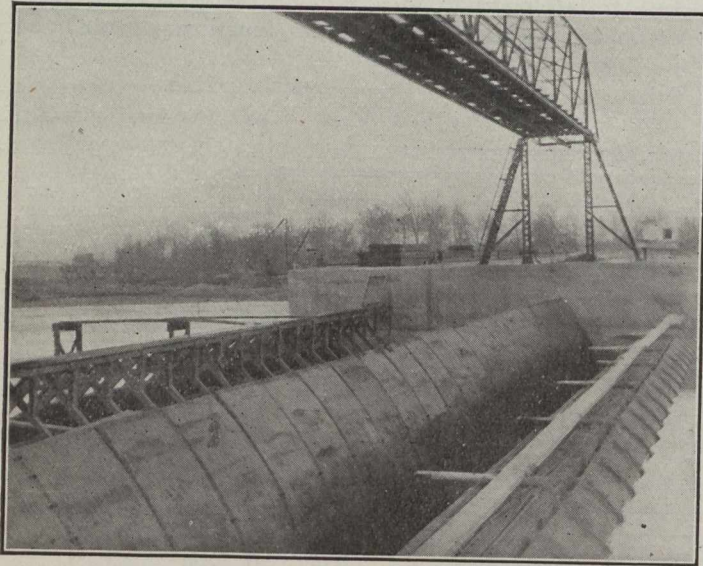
Automatic Sector Dam Under Erection, Showing Cofferdam.
